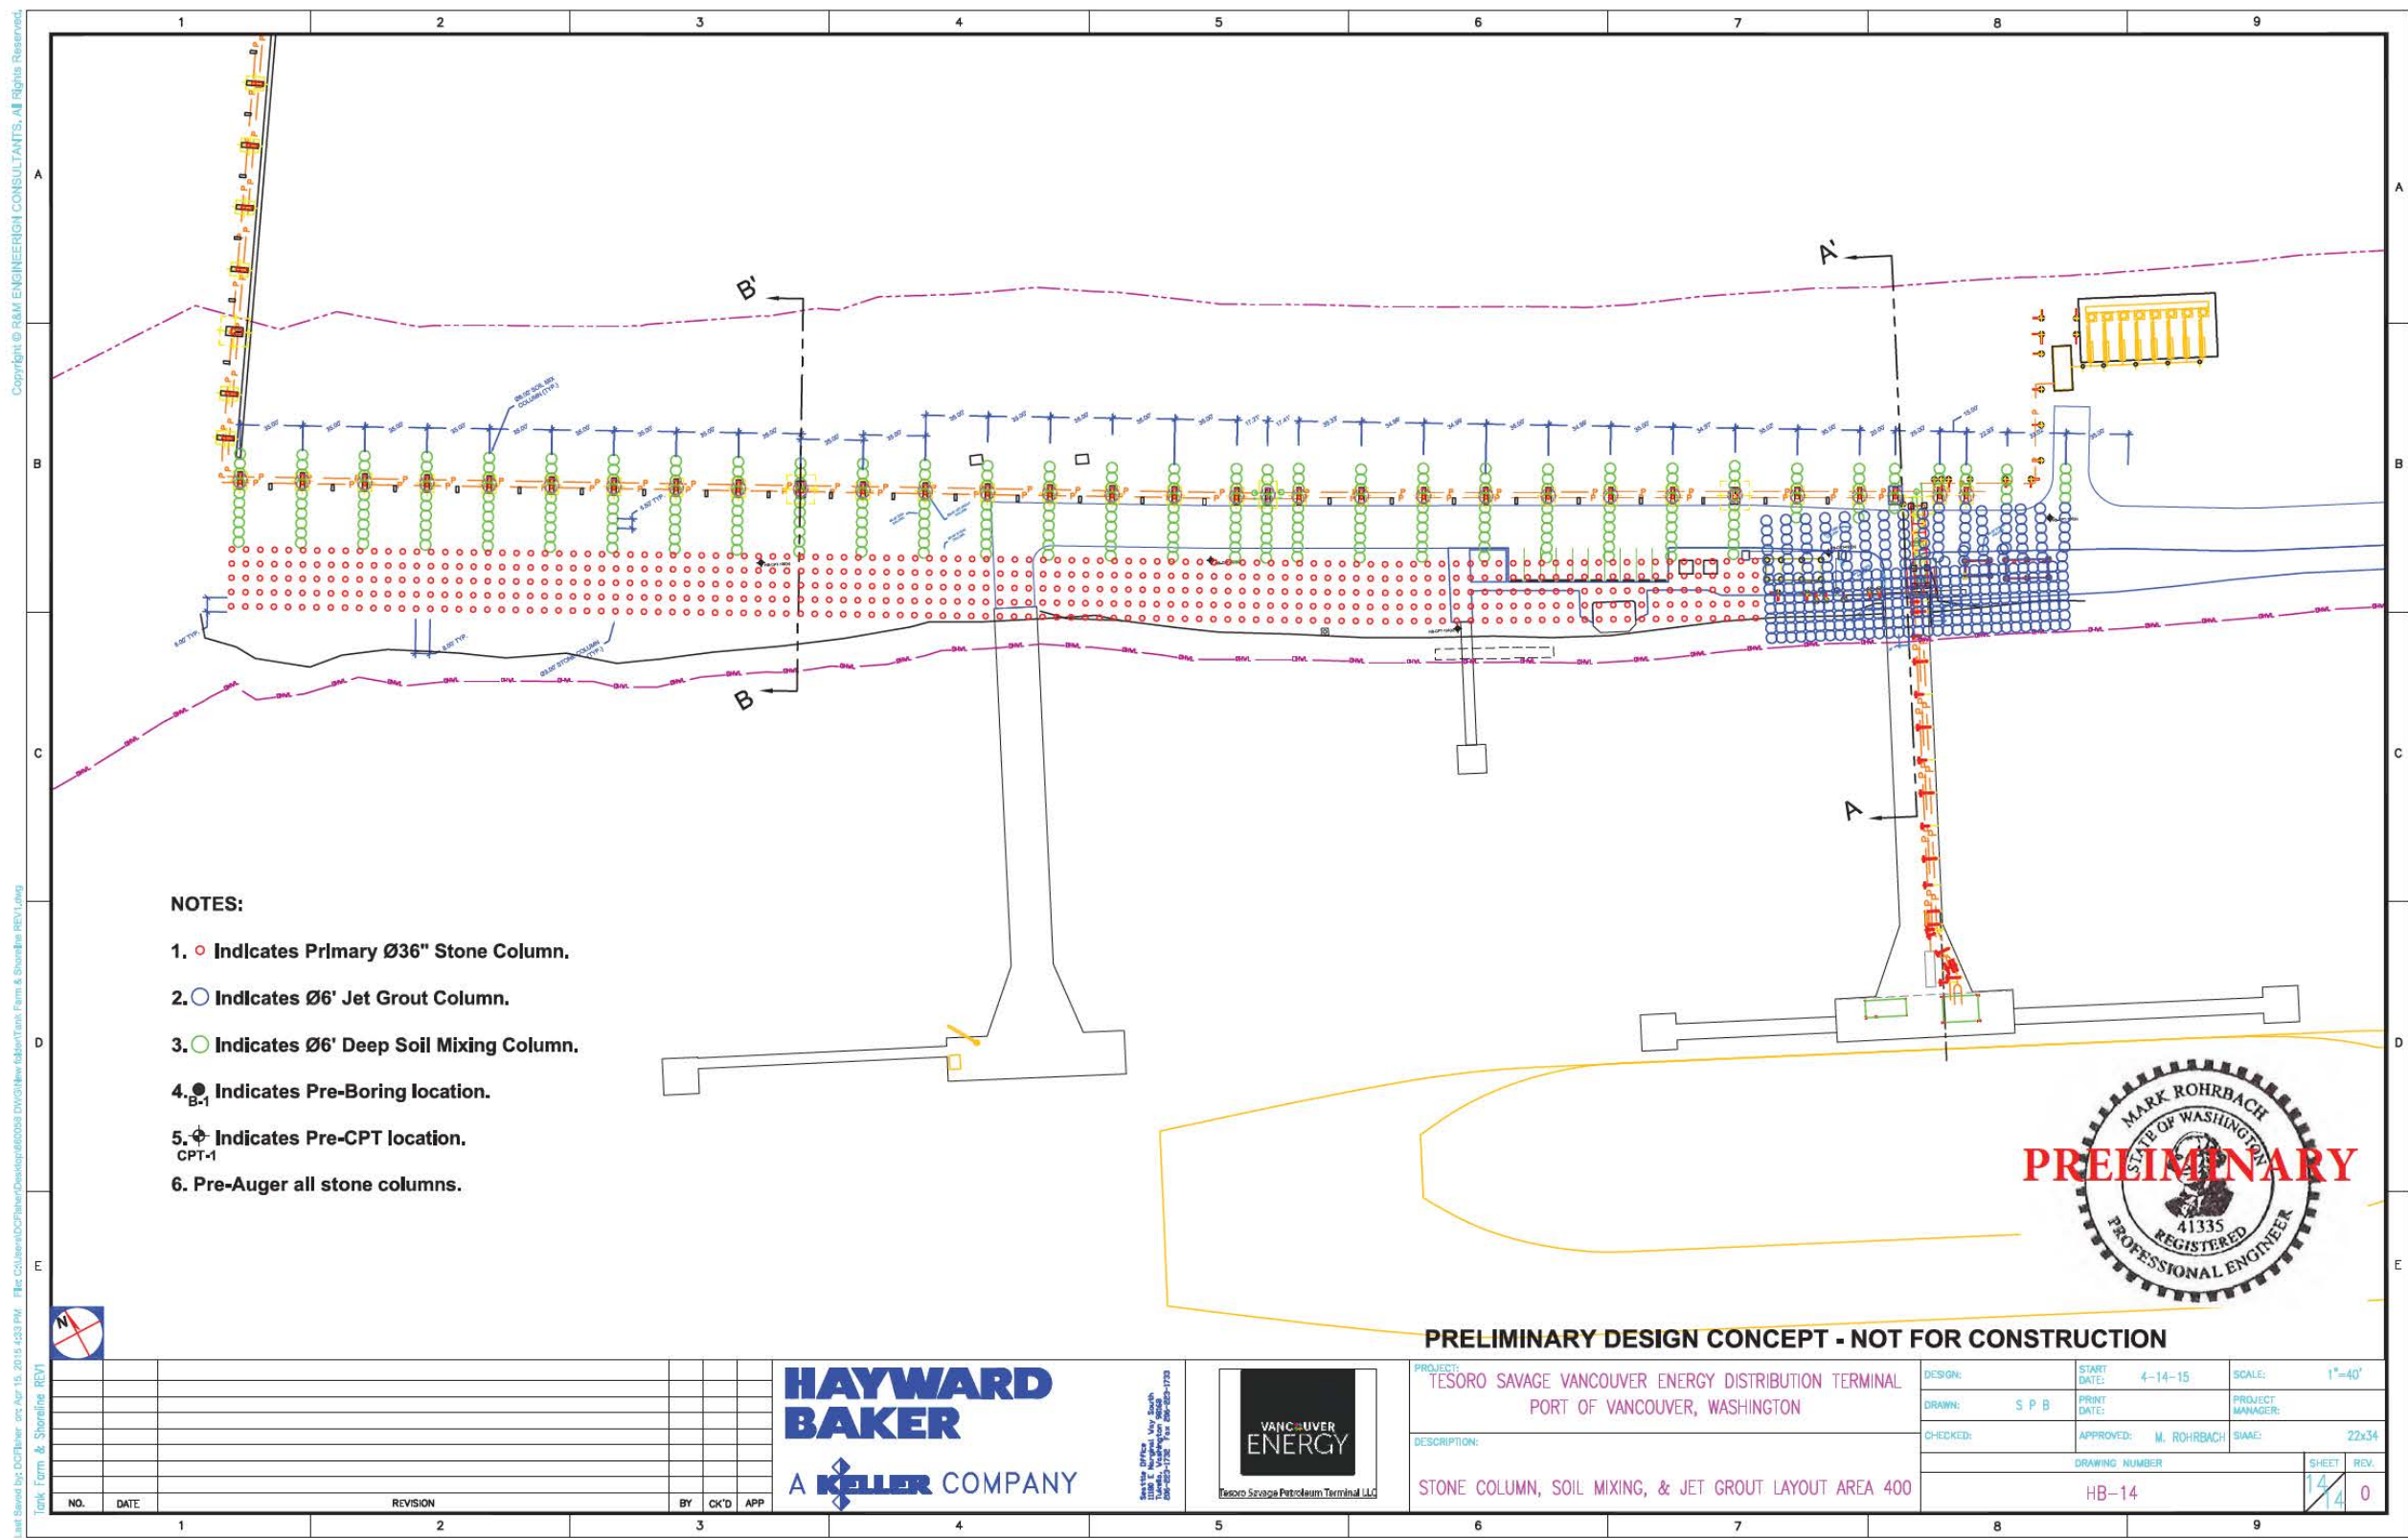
Stone Column, Soil Mixing, and Jet Grout Laydown Area
